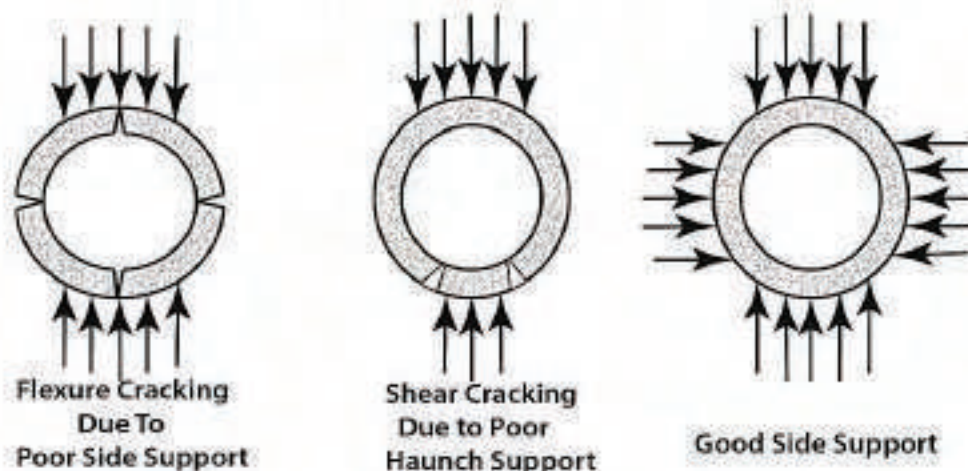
Longitudinal Cracks in Concrete Pipe
